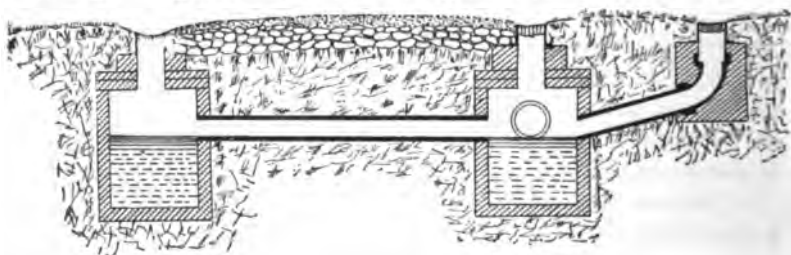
SECTION OF PARK WALK, SHOWING THE MANNER OF REMOVING THE SURFACE WATER.
